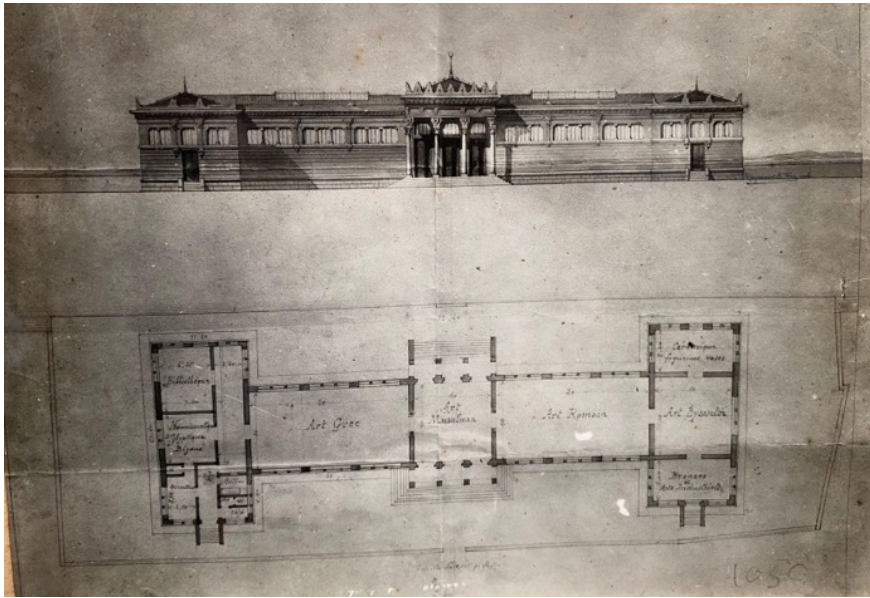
An alternative conceptual plan and elevation drawing with traditional motifs, found in the IAM-Photography Archive
